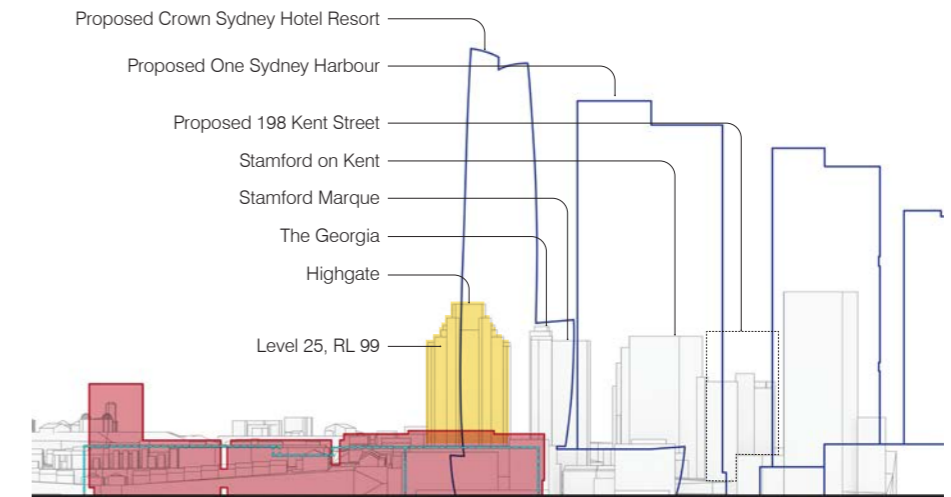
Elevation Looking East - MOD 9 with the Approved Concept Plan shown in light blue outline (Source: Modified from HASSELL diagrams (November 2018))
